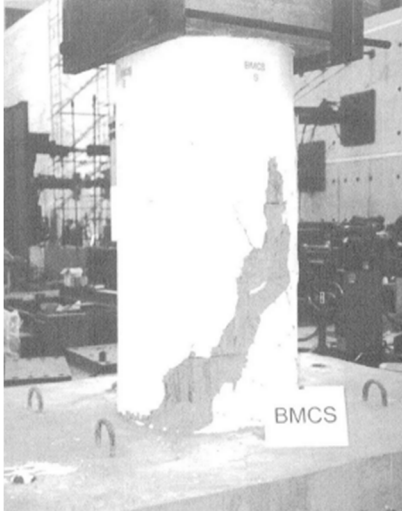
Specimen BMCS from Li and Sung (2003) following failure, shown as an example of a column with shear failure as its primary damage state.
